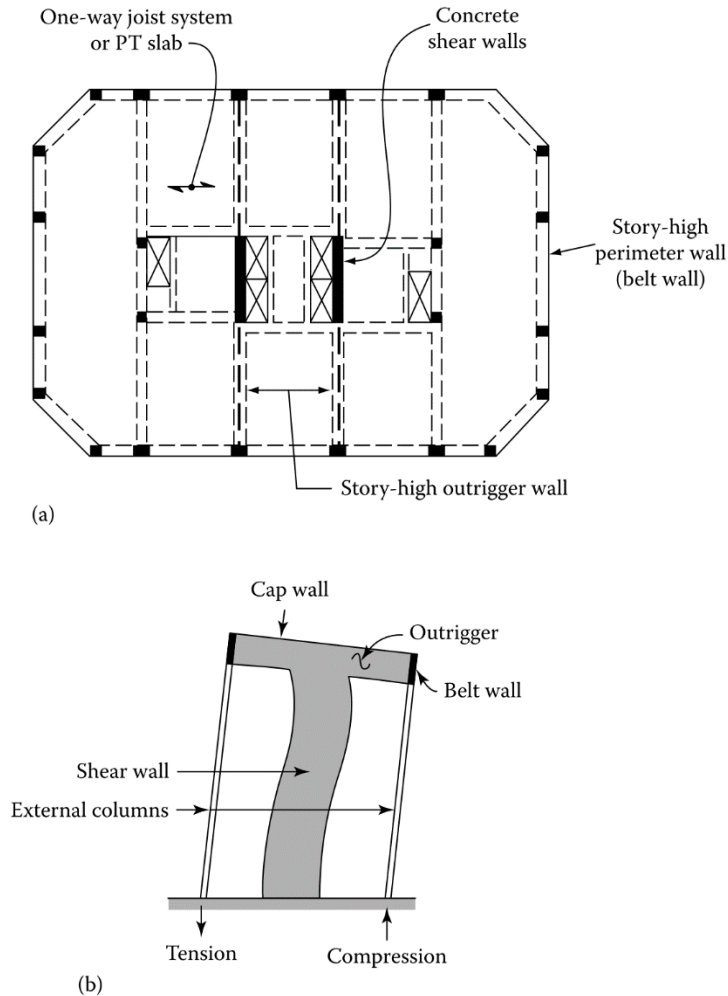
Cap wall system: (a) Plan and (b) Schematic section.
